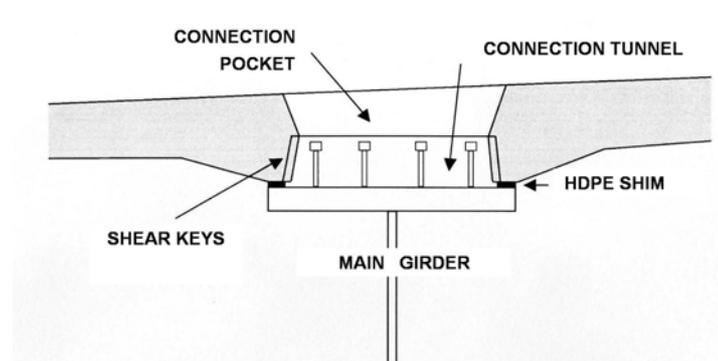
Central section-cantilever connection conditions during construction, adopted since 2005
